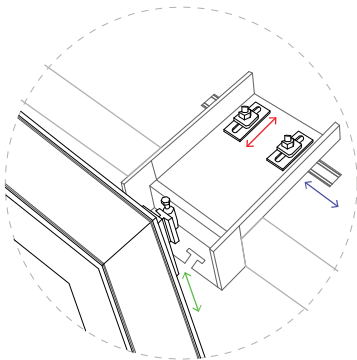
Structural bracket detail connection between mullion and concrete slab (from the top)
